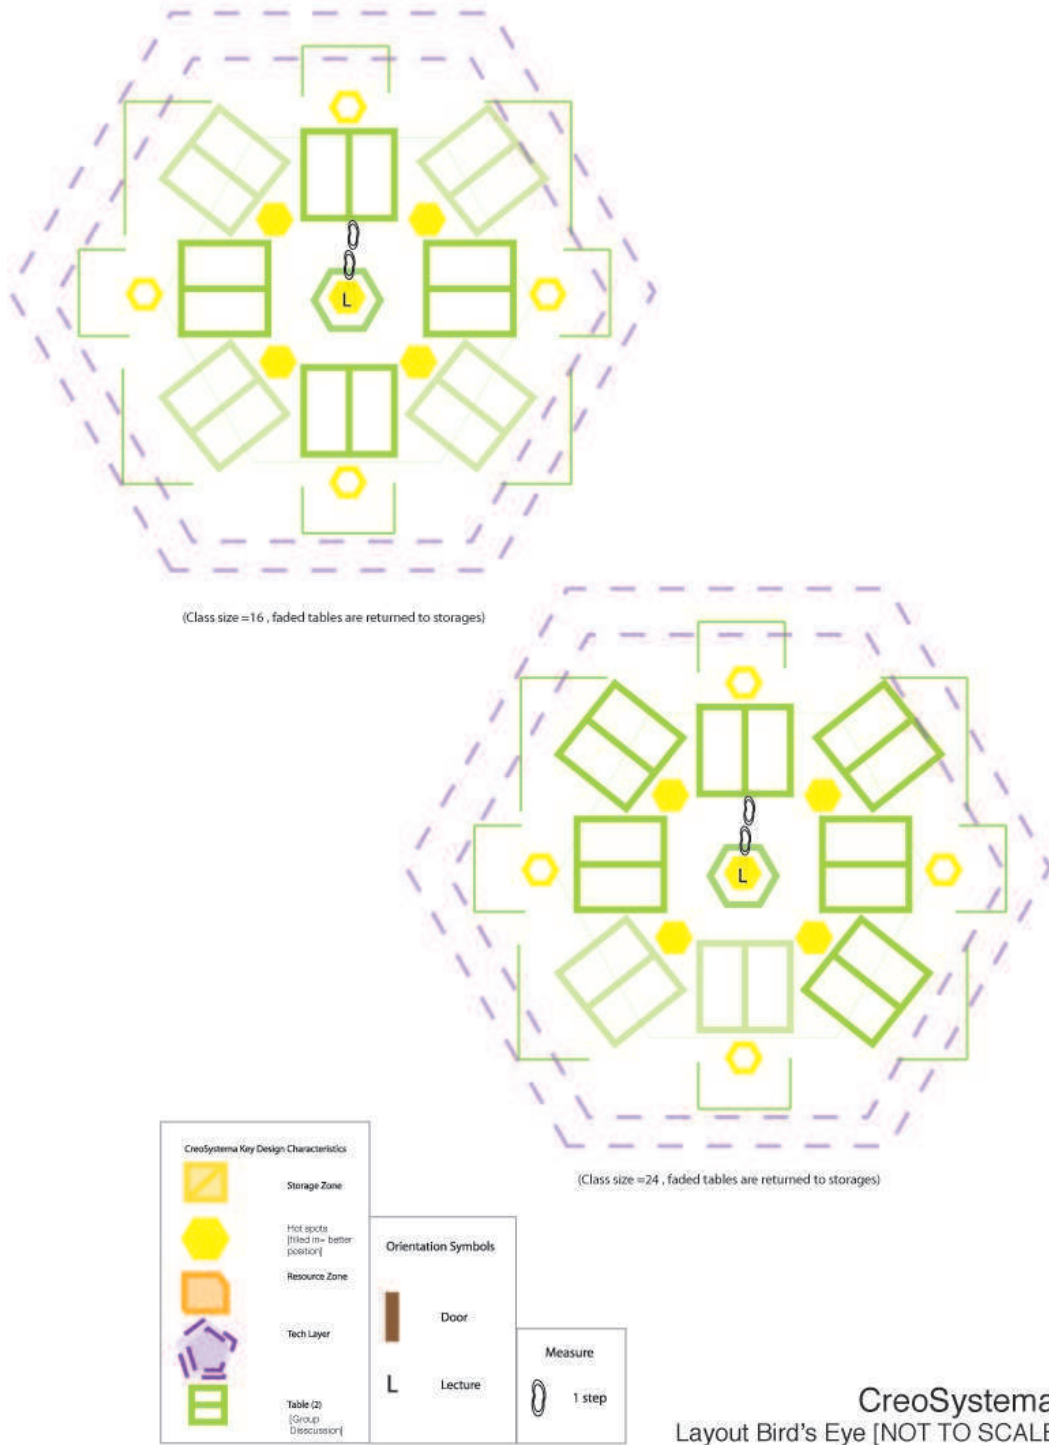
Alternative suggestion of floor plan, for less than 32 students. Again, according to proposed principles. 83
